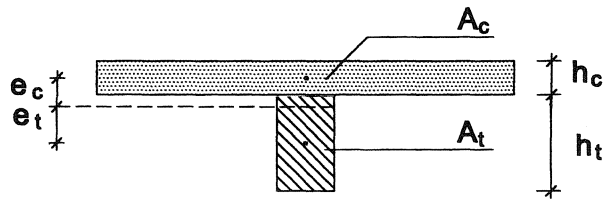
Eccentricities and cross sectional areas of the concrete slab and timber beam.
